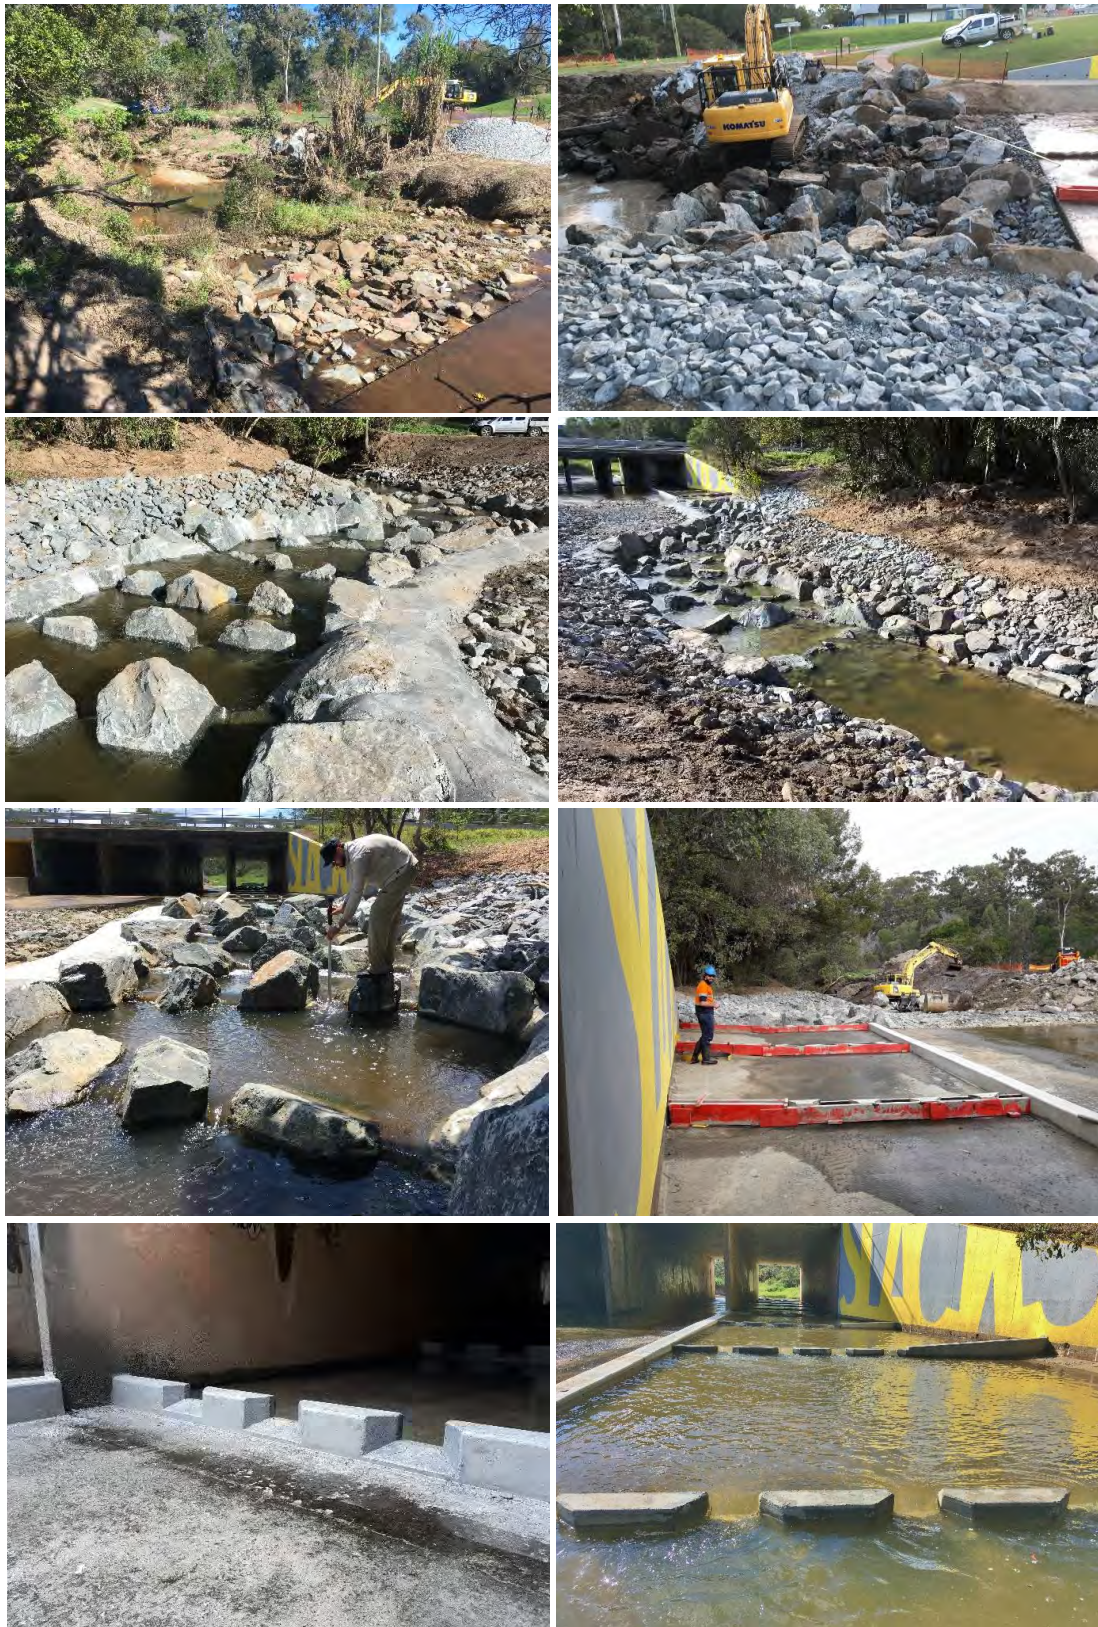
Showing during and post construction of the rock-ramp and horizontal culvert baffle fishways
